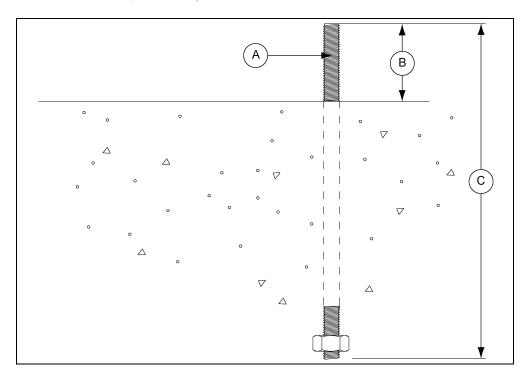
C Anchor Bolt Example (3/4" Diameter Anchor Bolt Shown)
